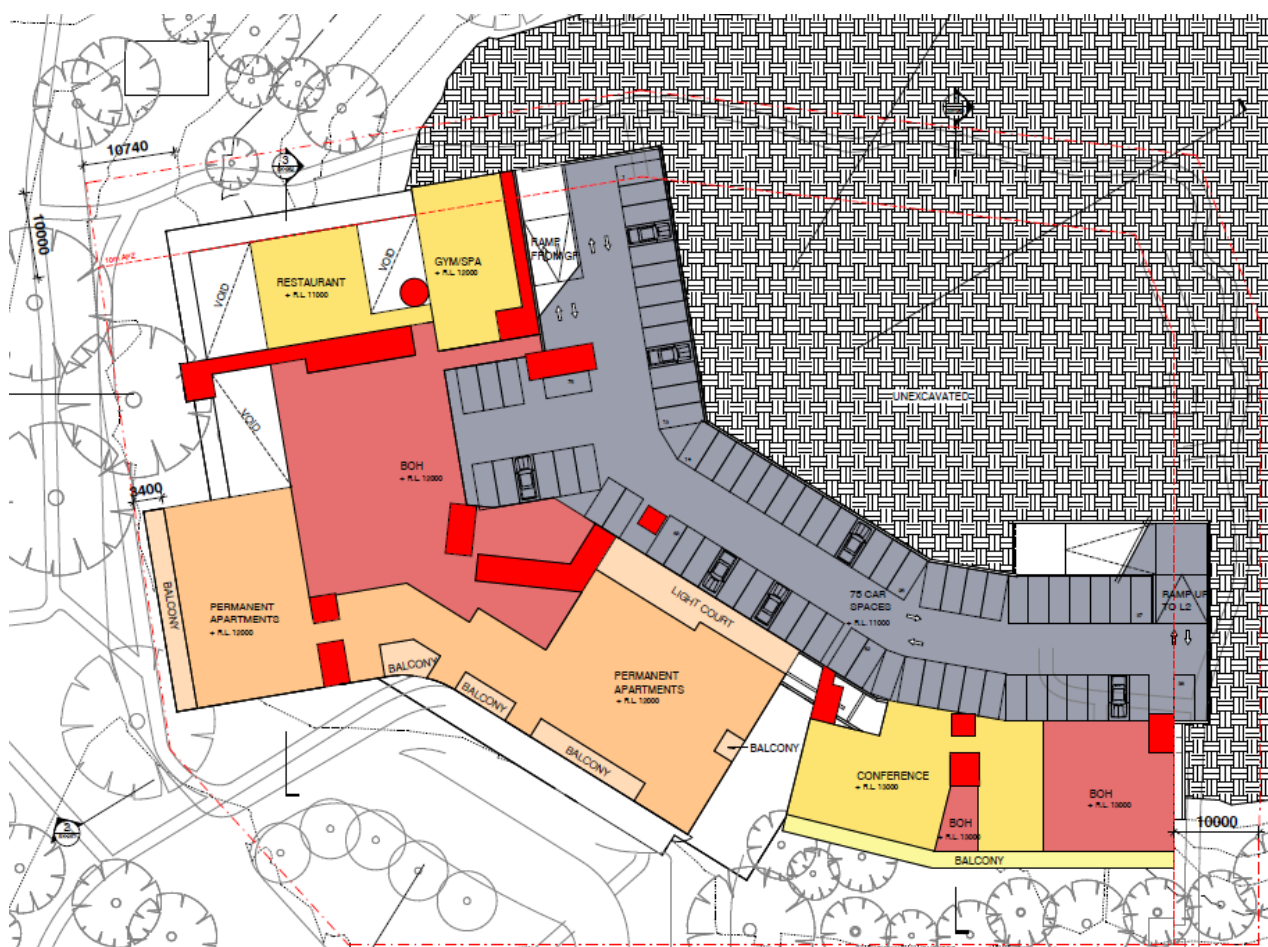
Modified Level 1 of Concept Plan No. MP06_0183
